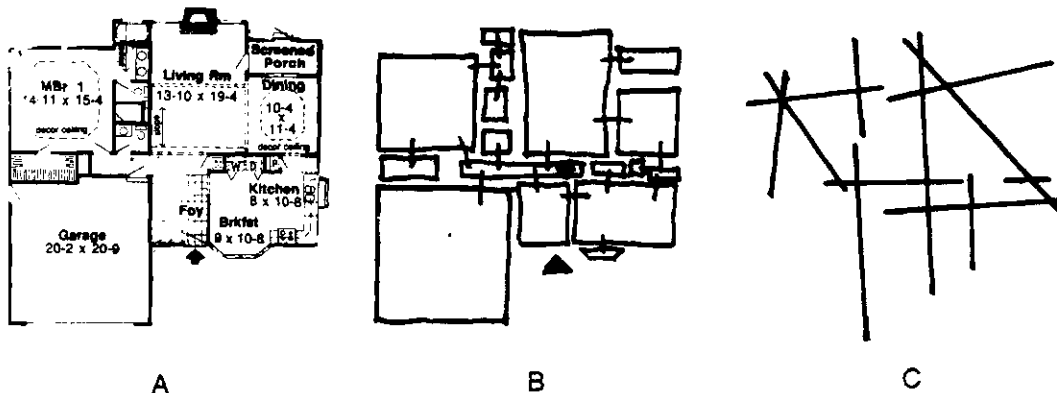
(a) Floor Plan of a House and (b) Its Convex and (c) Axial Maps
